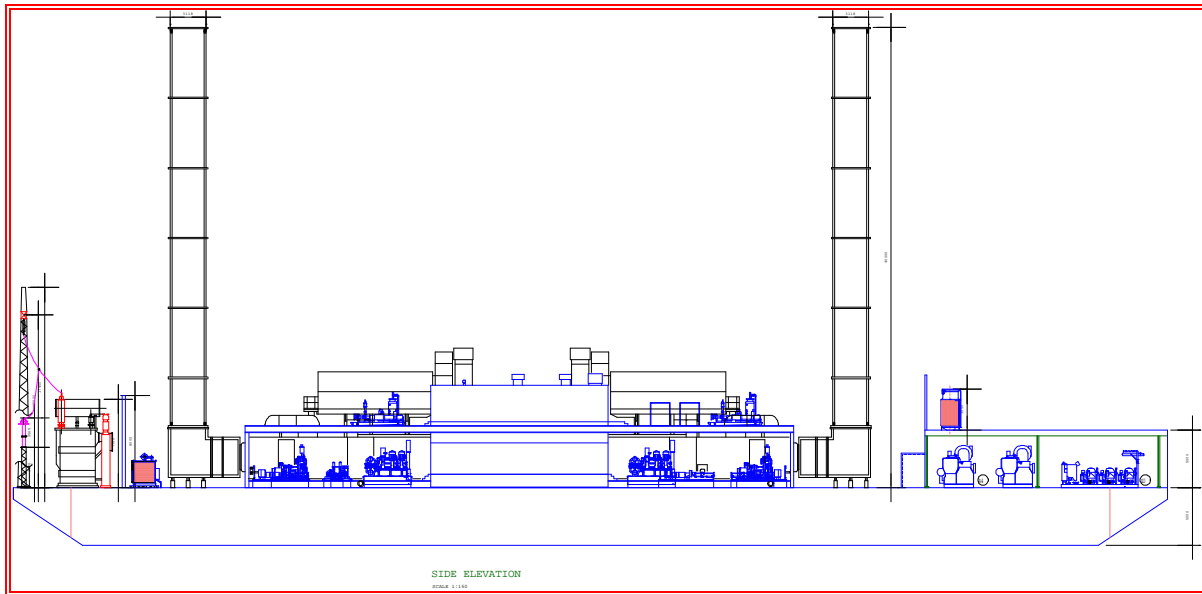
Detailed elevation view of the upper deck of a Simple Cycle Power Barge
